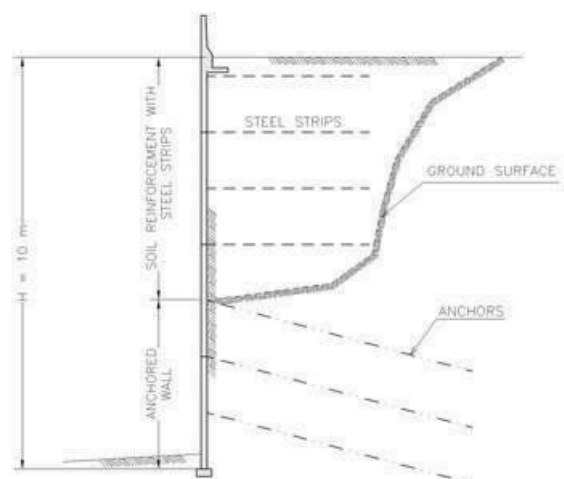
Typical cross-section of mixed reinforced fill-anchored wall.
